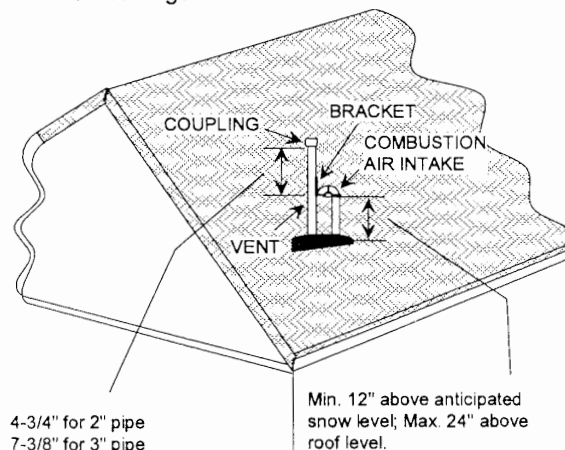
TYPICAL ROOFTOP TERMINATION
